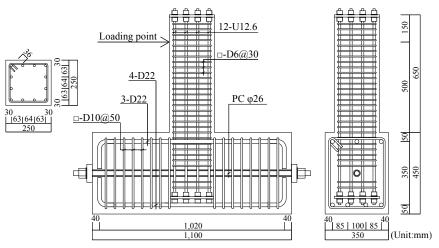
Reinforcement details of specimens with SBPDN12.6 rebars
